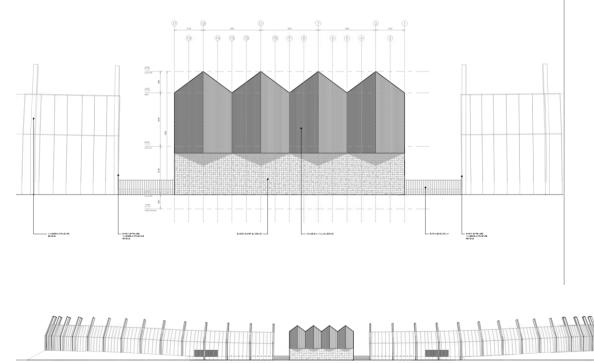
Pavilion Building (Proposed Revised Scheme)
